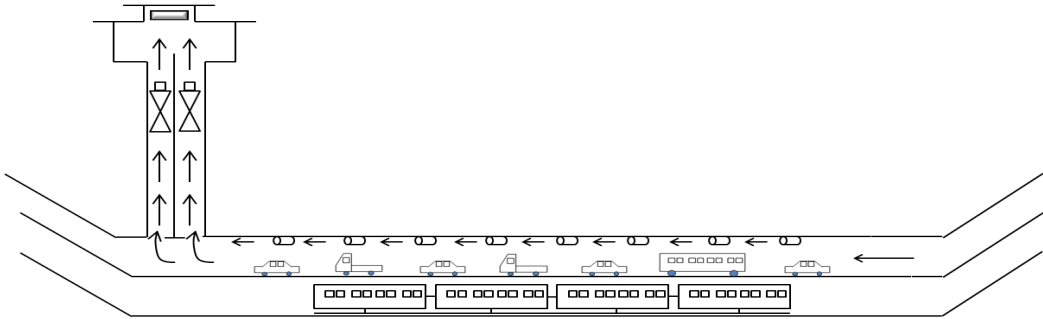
Shanghai Yangtze River Tunnel Ventilation System
